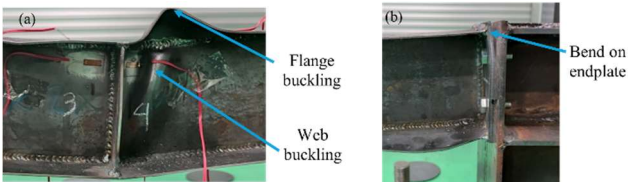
Failure on pipe support with stiffener reinforcement (a) buckling and (b) bend on endplate
